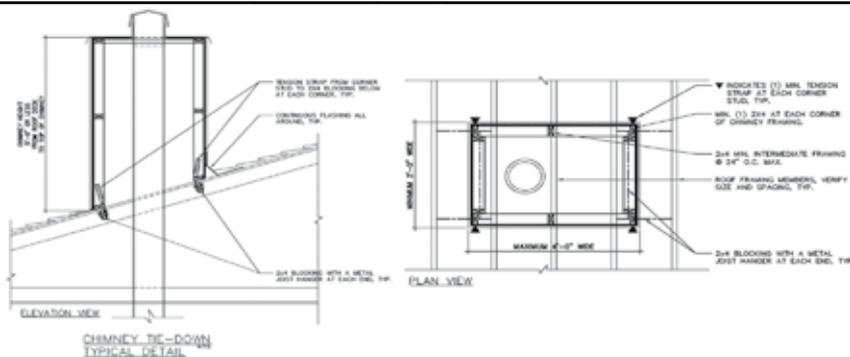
TYPICAL CHIMNEY TIE-DOWN DETAILS
